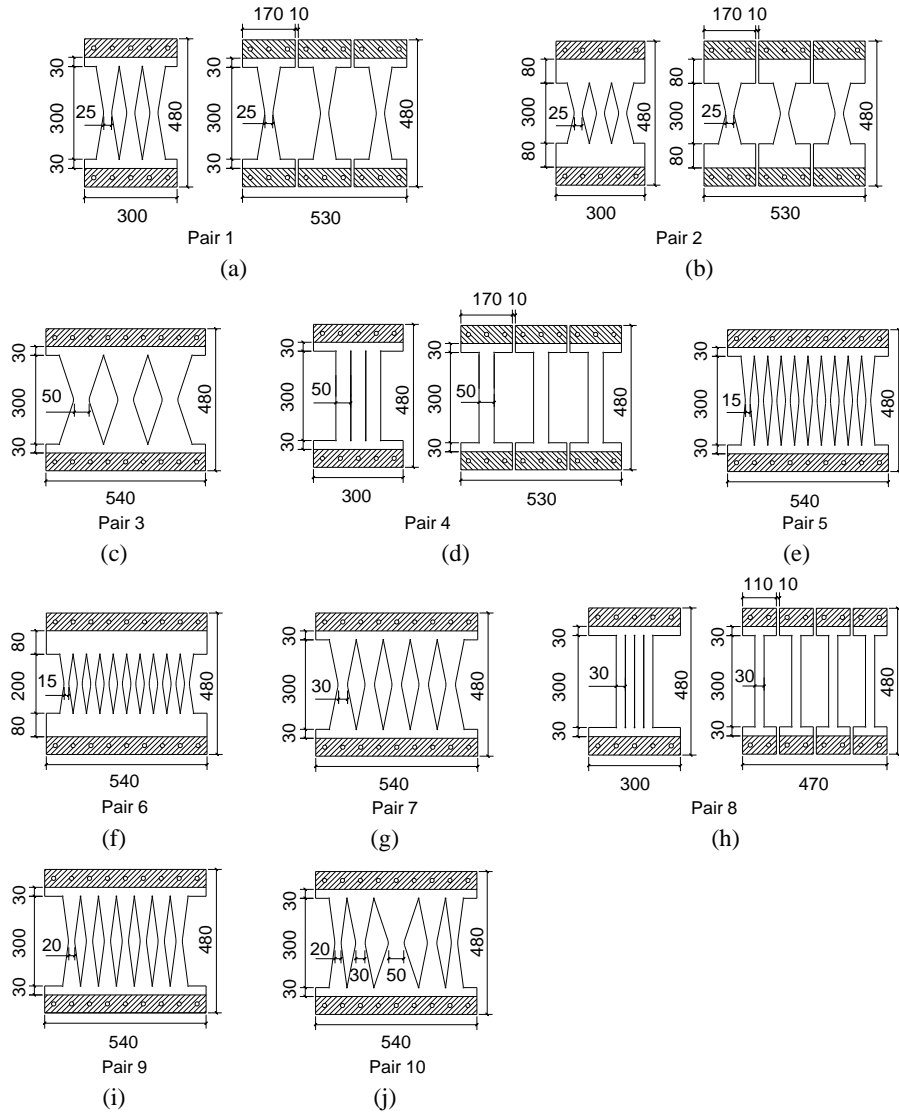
Details of specimens (unit: mm): (a) to (j) Pairs 1 to 10.
